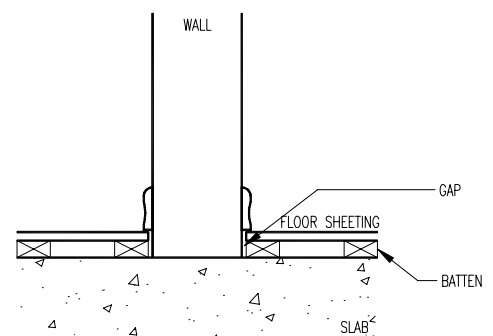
Floor Lateral Vibration Isolation - Good Design practice
